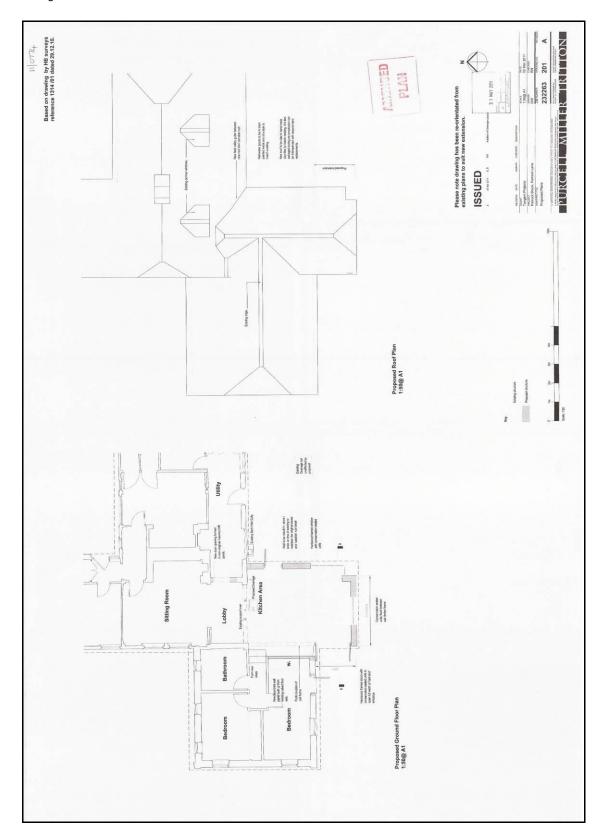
Parrock Brook, Hartfield: Proposed Development Plan (Adapted from architects drawing)
